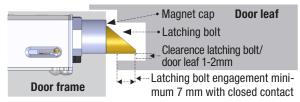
Locking engagement and clearance viewed from the bottom of the lock.
